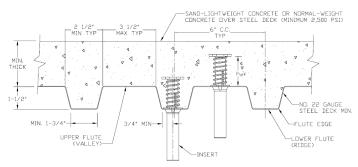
B—BANG-IT+ INSERTS INSTALLED IN SOFFIT OF CONCRETE-FILLED STEEL DECK FLOOR AND ROOF ASSEMBLIES^{1,2,3,5,6,7}
